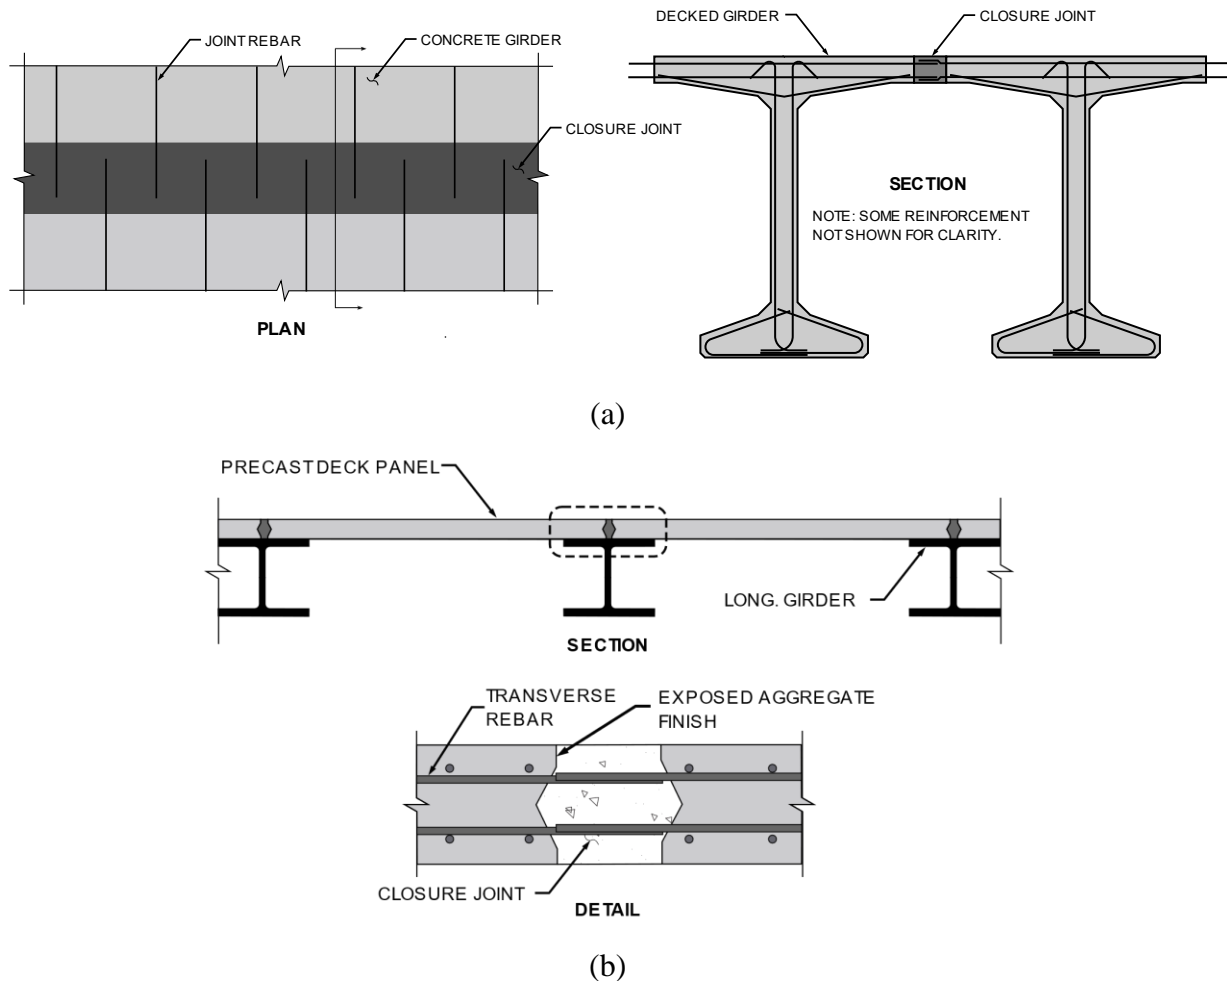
(a) Precast concrete girder closure joint - plan and section, adapted from Peruchini (2017), (b) precast deck panel closure joint - section and detail
